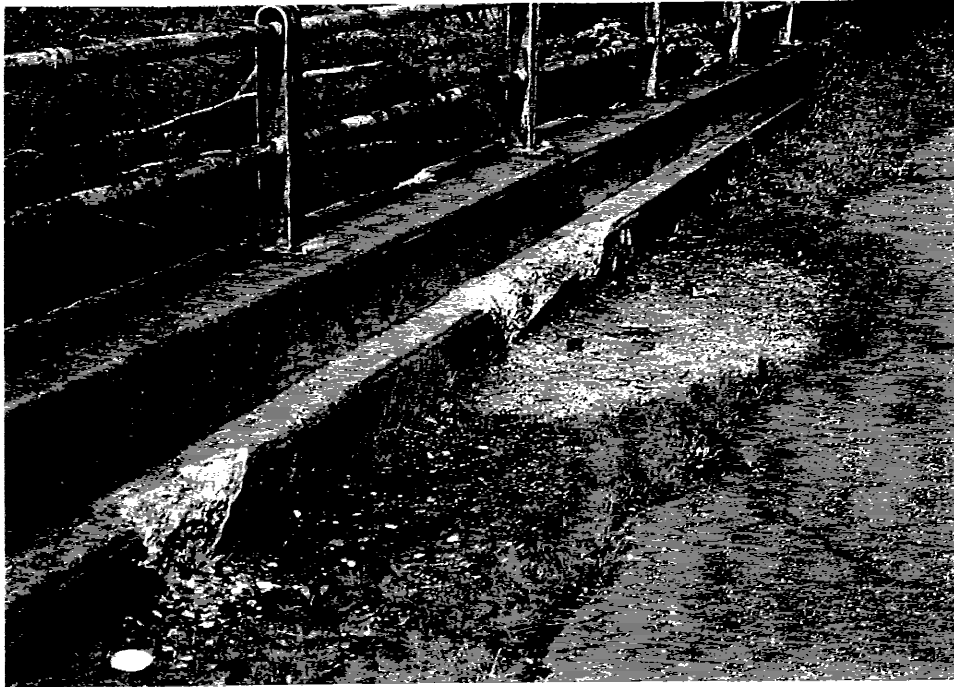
Extensive spalling of the south curb and parapet. Note also the missing bituminous paving and the heavy vegetation.
